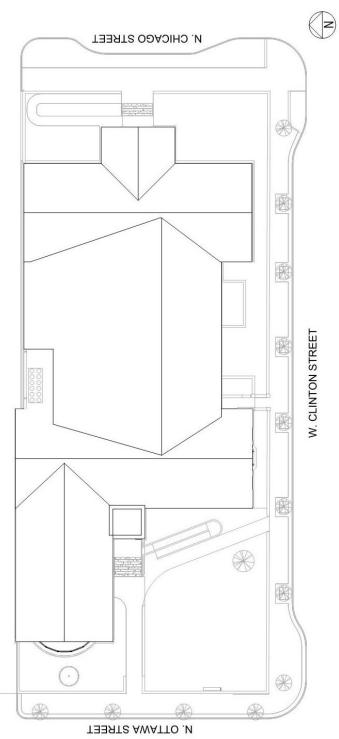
Site sketch floor plan, not to scale. (JLK Architects 2025)
